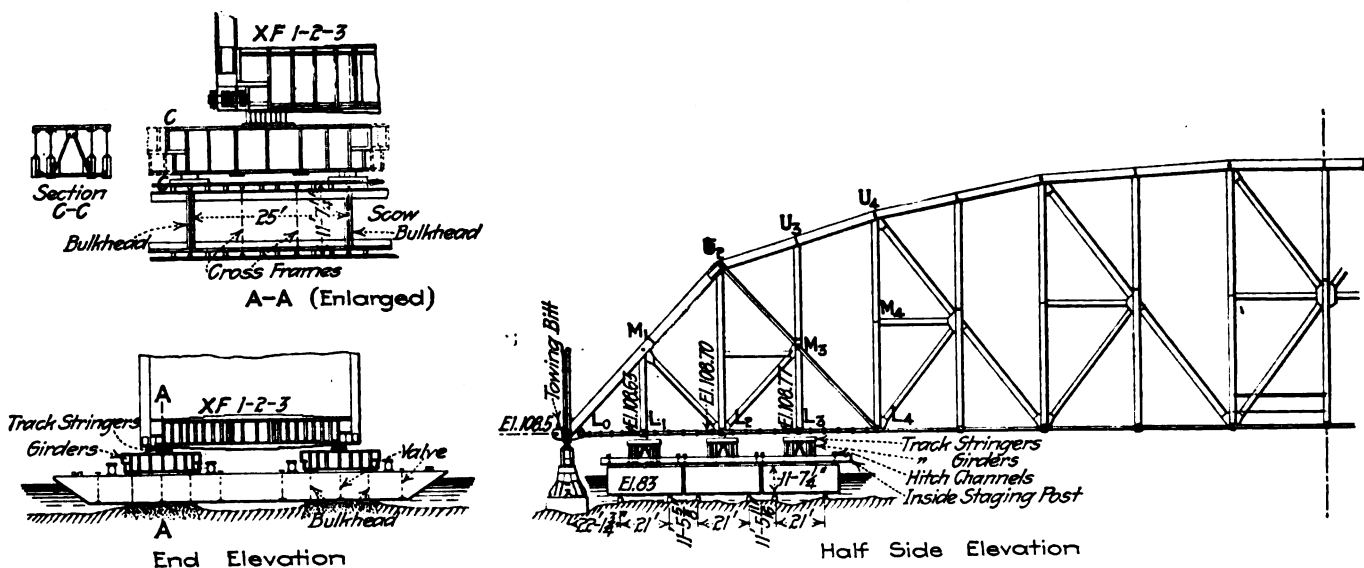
ARRANGEMENTS FOR FLOATING THE SUSPENDED SPAN OF THE QUEBEC BRIDGE
